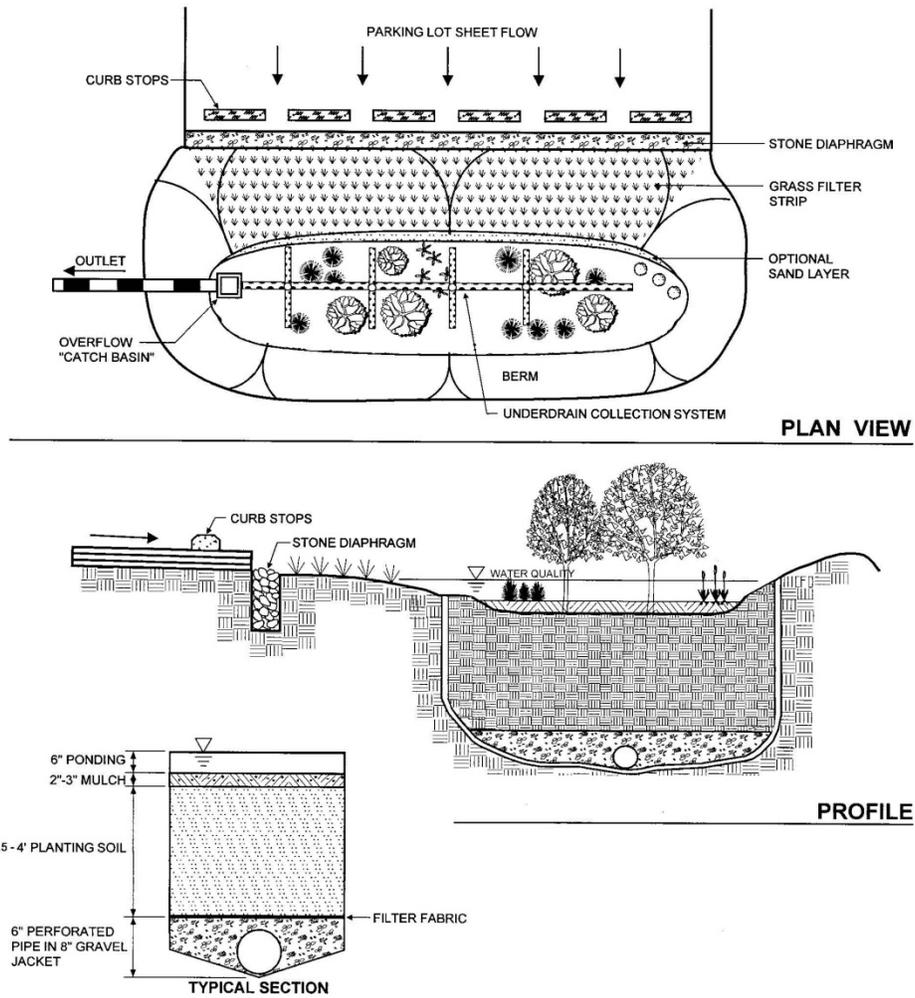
Biofilter typical plan and cross-section. *Source: NYS Stormwater Manual
